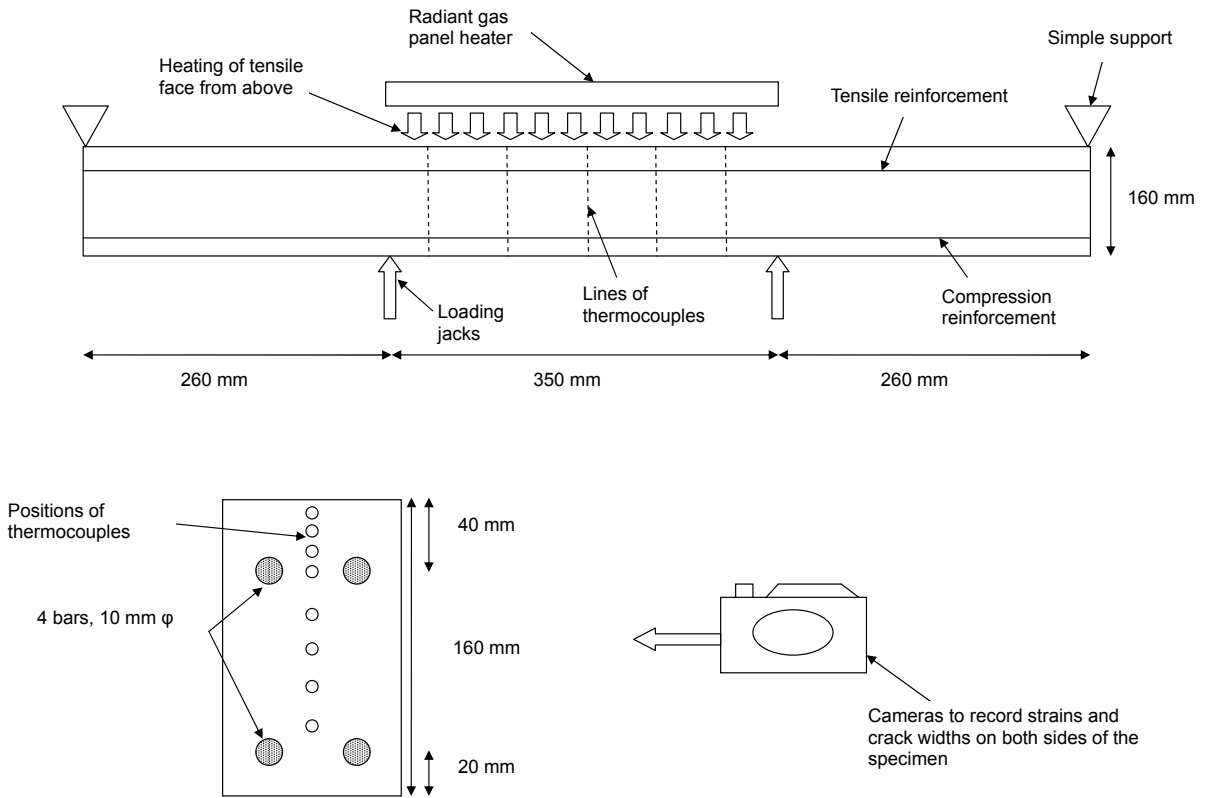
Experimental apparatus set-up for the investigation into the thermal propagation through tensile cracks in reinforced concrete. A side-view of a beam, a typical section and general locations of the thermocouples are shown
